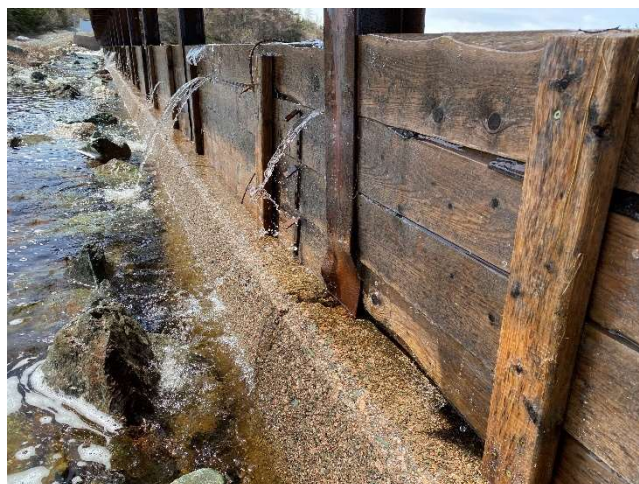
Stoplogs at Mount Carmel Pond spillway
